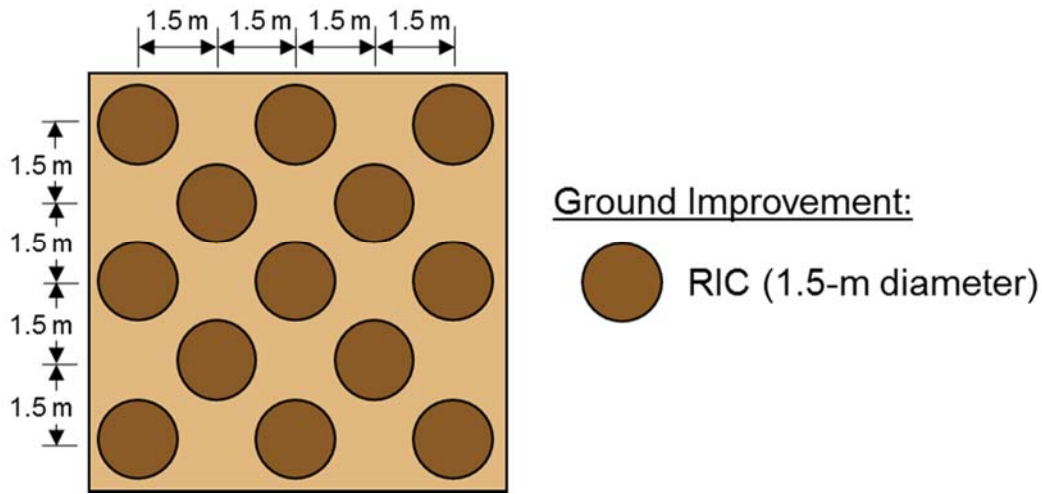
Plan view of the RIC impact points layout used at Sites 3, 4, and 6.
